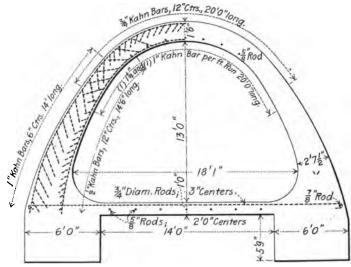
Kilton Culvert, North Eastern Railway. (Ball.)
